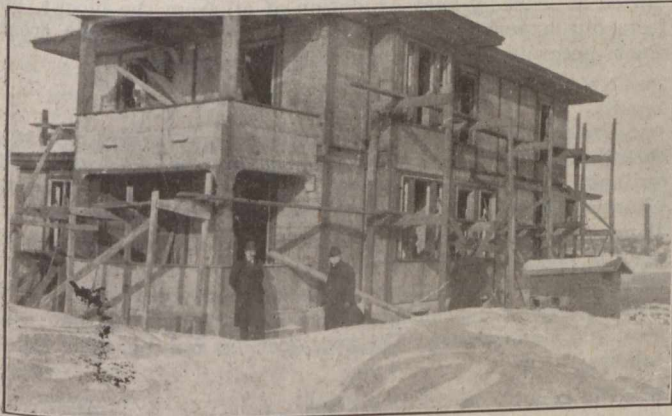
FRAMES AND REINFORCEMENT IN PLACE
